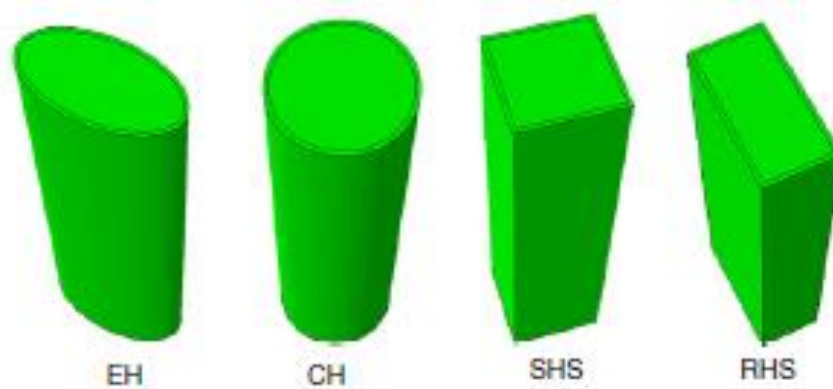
17 - Typical shapes of selected concrete filled steel tubular stub columns (Dai and Lam, 2012).
